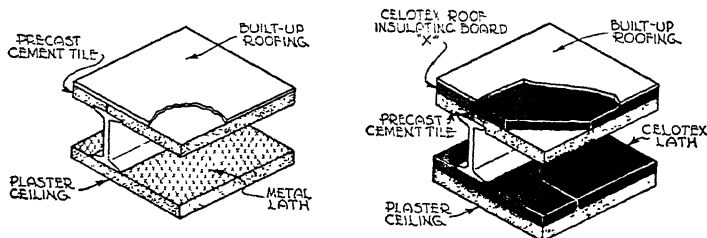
Typical Roof Insulation on Precast Cement Tile Construction
